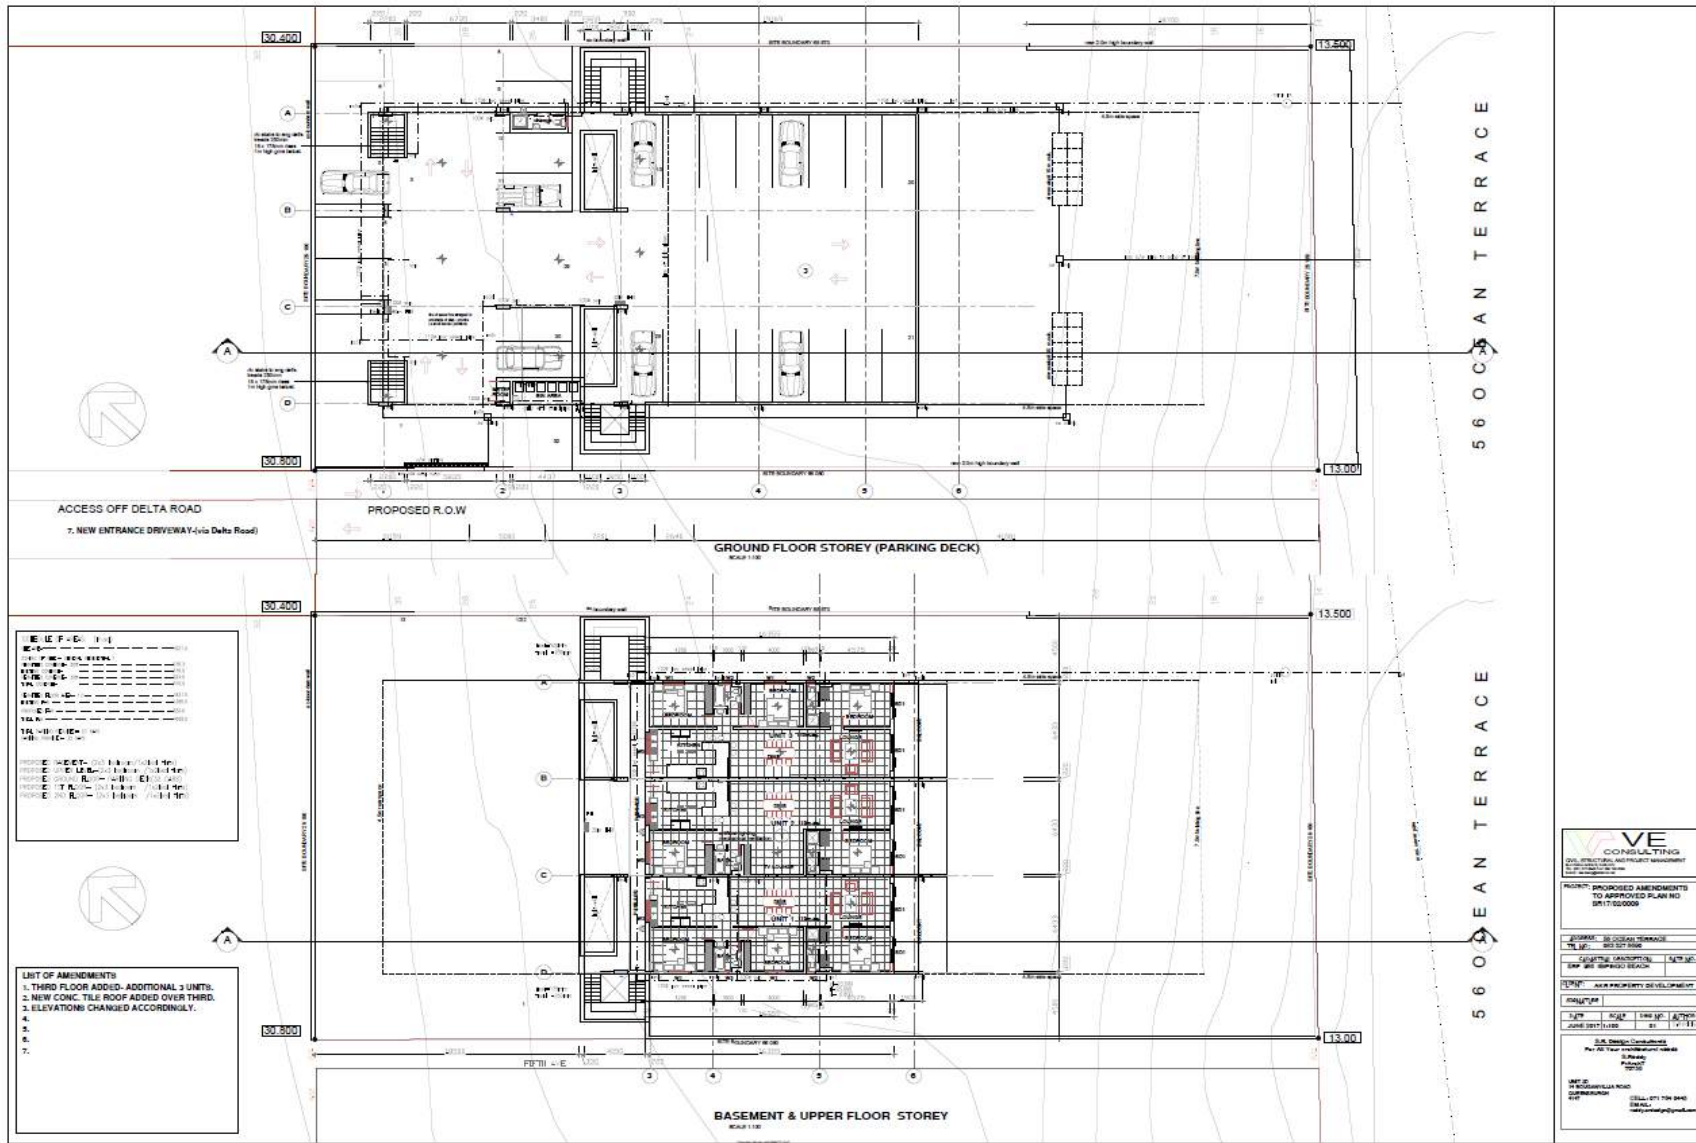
Layout 1 – Development Plan of the Basement and Upper Floor as well as Ground Floor (Drawing No. SR17/02/0009)
